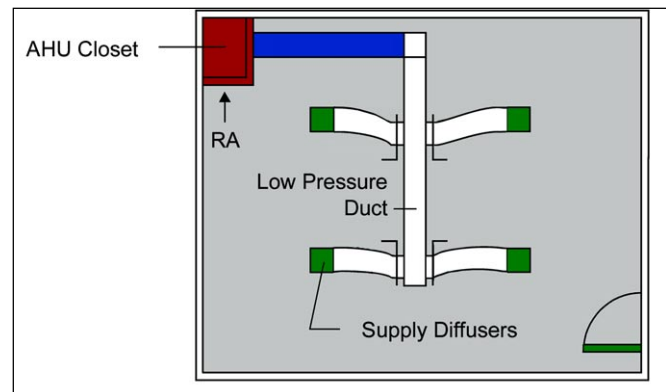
Typical layout of dedicated HVAC system serving classroom.
